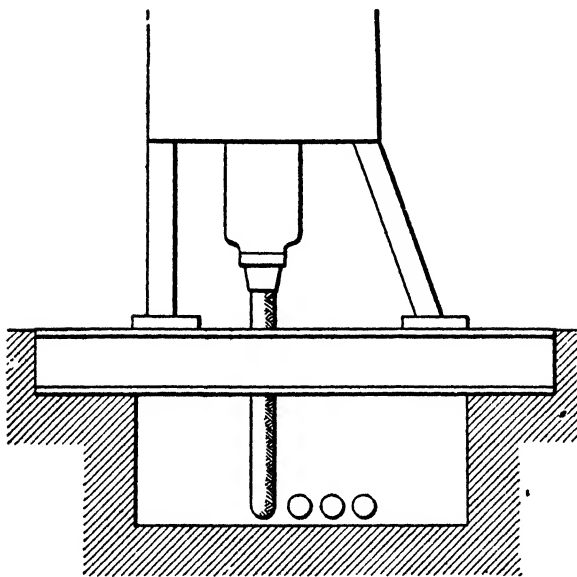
ARRANGEMENT OF CABLE TRENCH BENEATH SWITCHBOARD.
